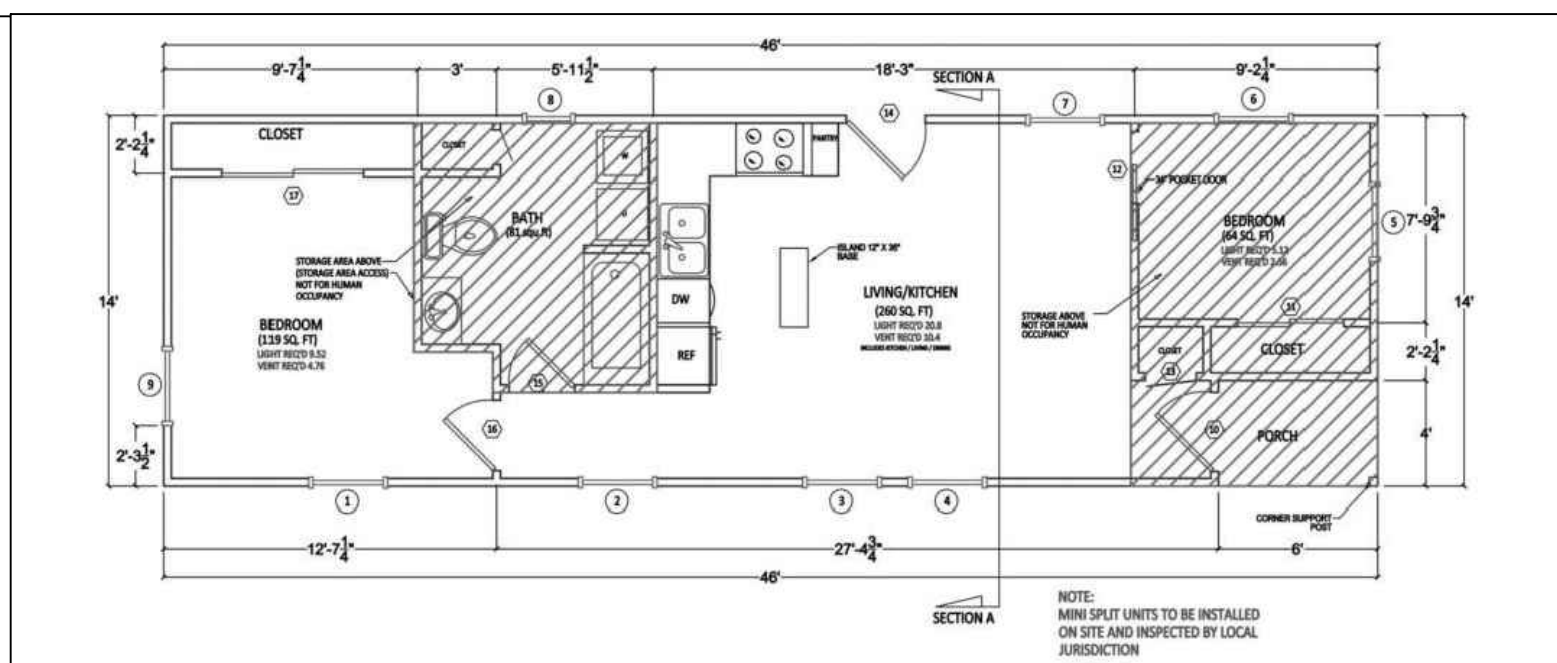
DEER RUN "ELK" CABIN FLOOR PLAN
